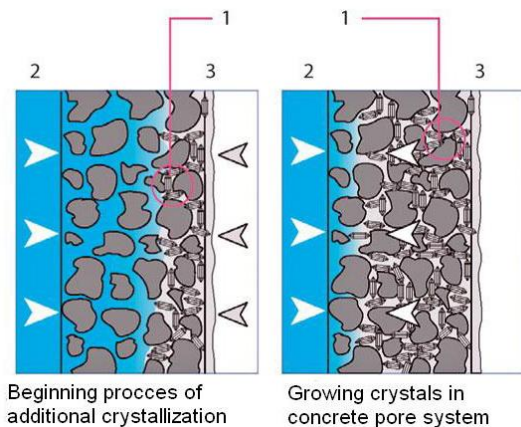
Schema of functional principle of crystallization backfilling on concrete construction 1 – plugging crystals, 2 – surface loaded by water pressure, 3 – surface with crystallization coating[3]
